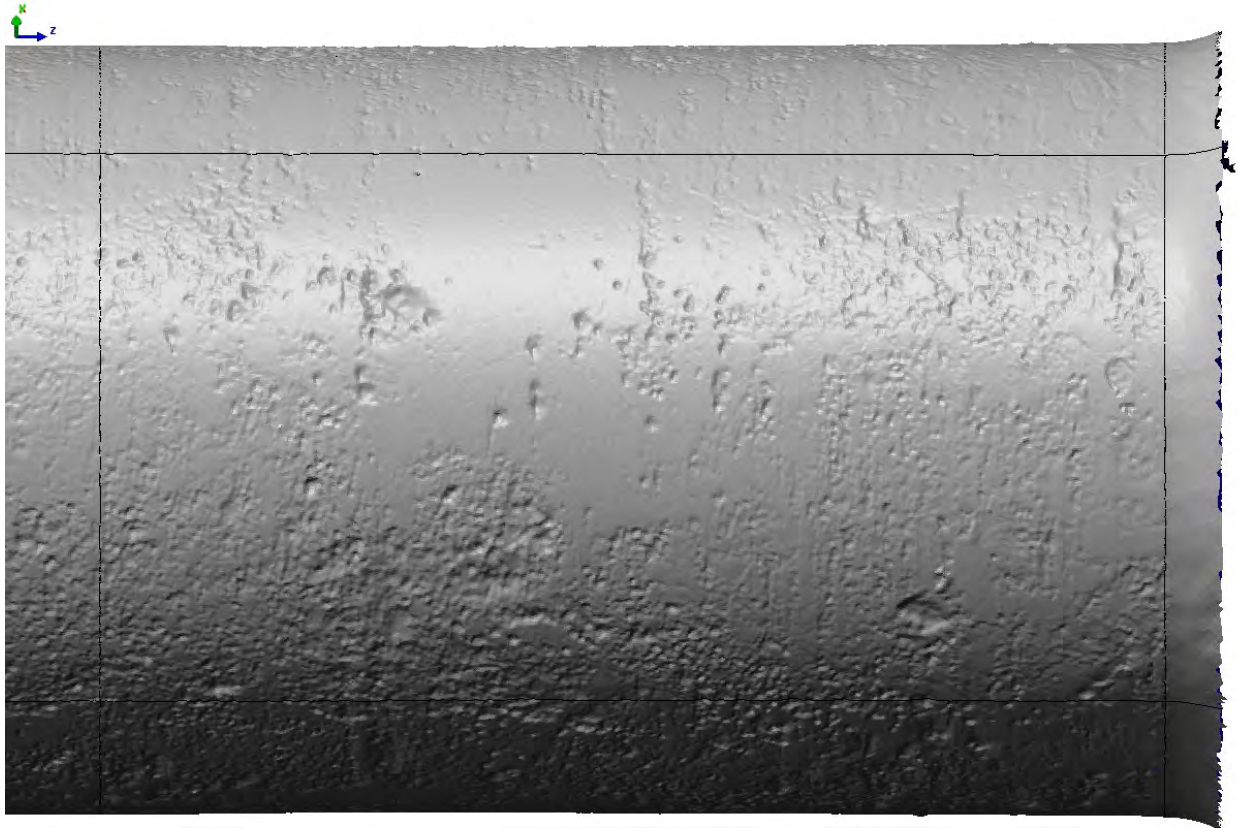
(13). Pipe from 9-12 feet and 0-90 degrees
